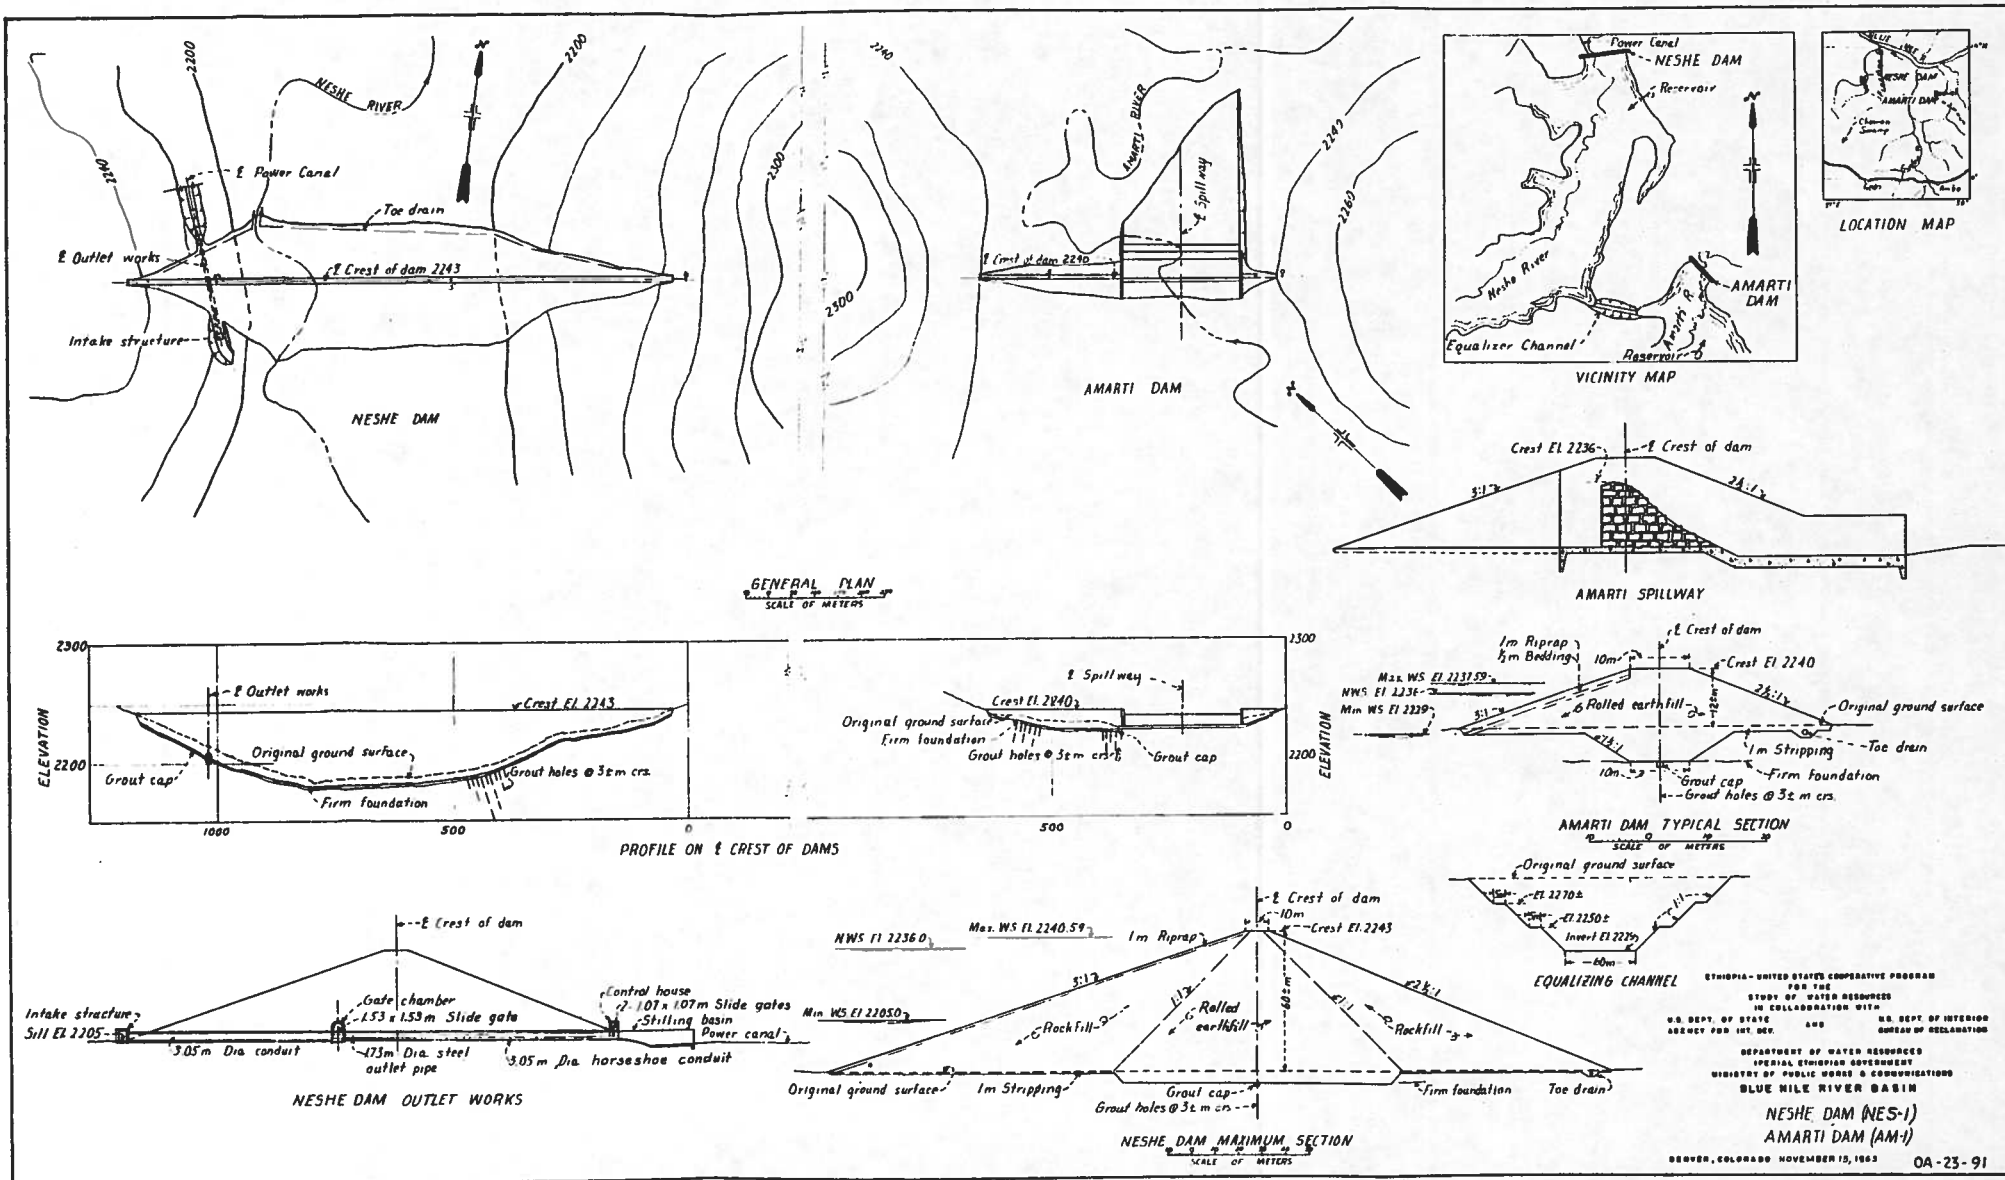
Neshe Dam (NES-1) and Amarti Dam (AM-1)--Plan and Sections
